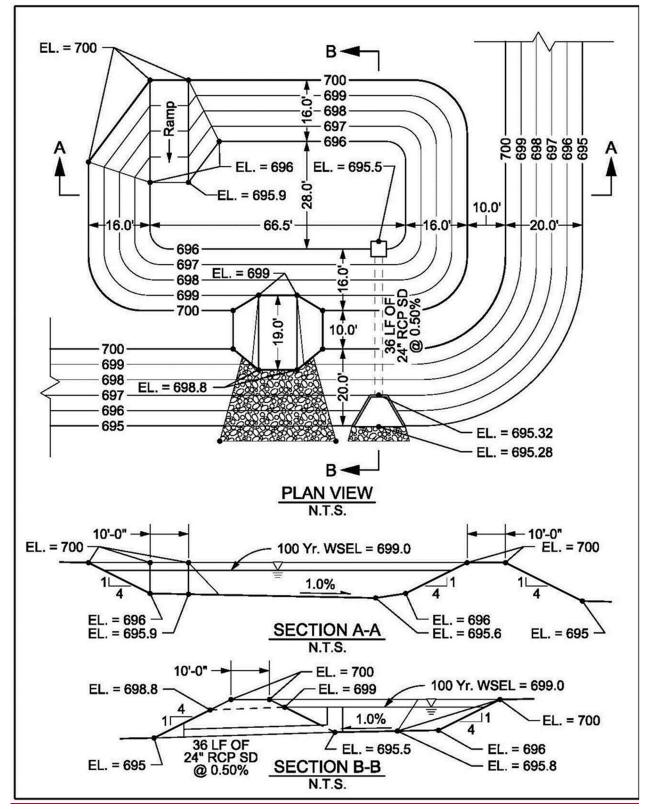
Typical Detention Pond Exhibit B – Example
